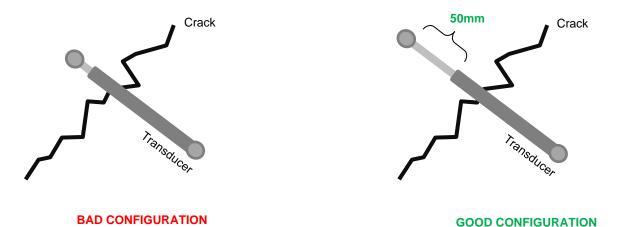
Illustration of the course out and the eyelets spacing of the transducer, example with a 50mm transducer.
